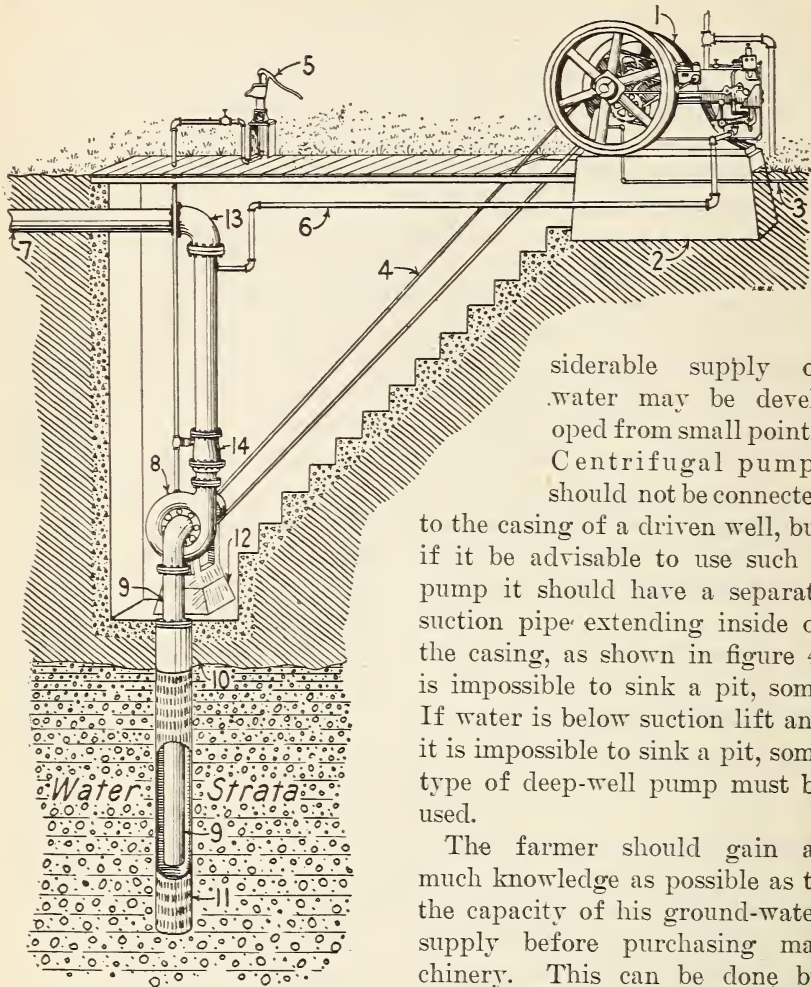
Typical installation of horizontal pump in brick or concrete pit with sloped belt. 1, Engine; 2, engine foundation; 3, fuel pipe; 4, belt; 5, priming hand pump; 6, water-cooling pipe for engine; 7, discharge pipe; 8, pump; 9, suction pipe; 10, well casing; 11, well screen; 12, pump foundation; 13, long-turn elbow; 14, check valve.
